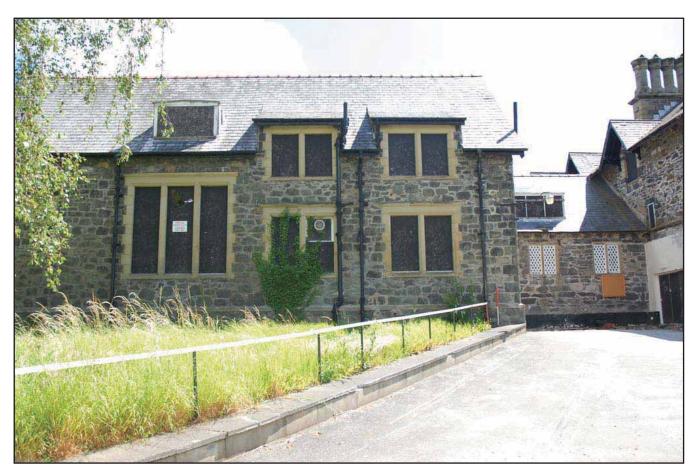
Extension A (Old Grammar School Block) - west facing elevation detail
